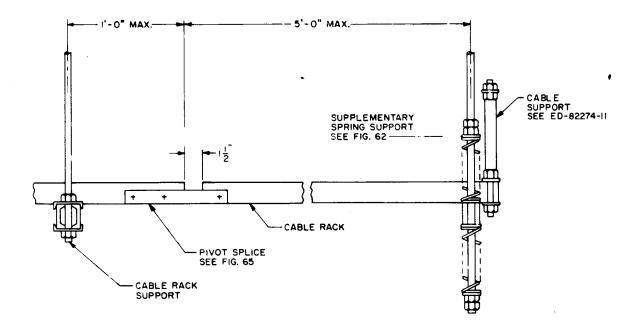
Spring Support for Cable Rack End—Power Cable Racks (A&M Only)
